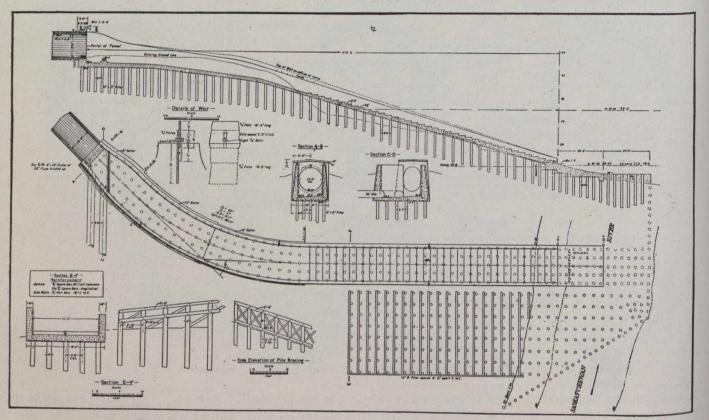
Plan, Profile and Details of Main Sewer Outlet, Edmonton.
